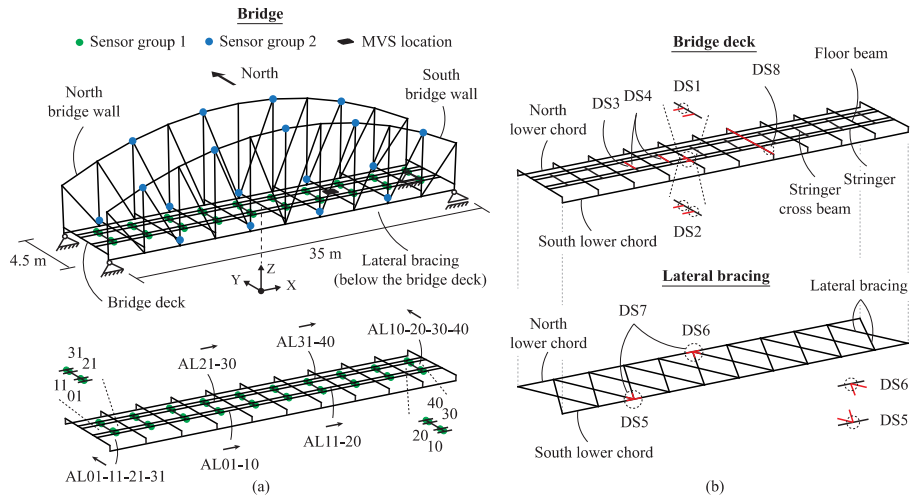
Overview of the Hell Bridge Test Arena. (a) Bridge structural system, sensor layout and location of the modal vibration shaker (MVS). (b) Damage states introduced to the bridge deck and lateral bracing.
